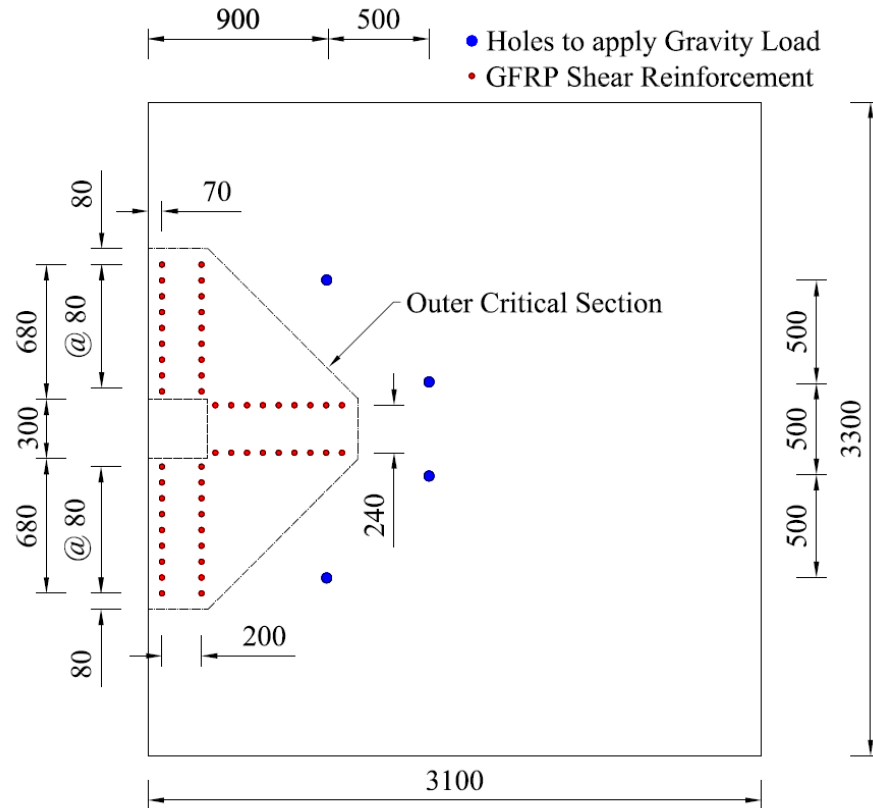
Shear reinforcement layout in specimens 6 and 7 (dimensions in mm)
